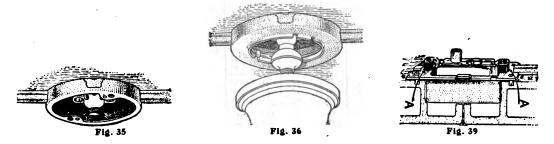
illustrates the No. 538 Box installed complete with fixture stud ready to hang fixture.
